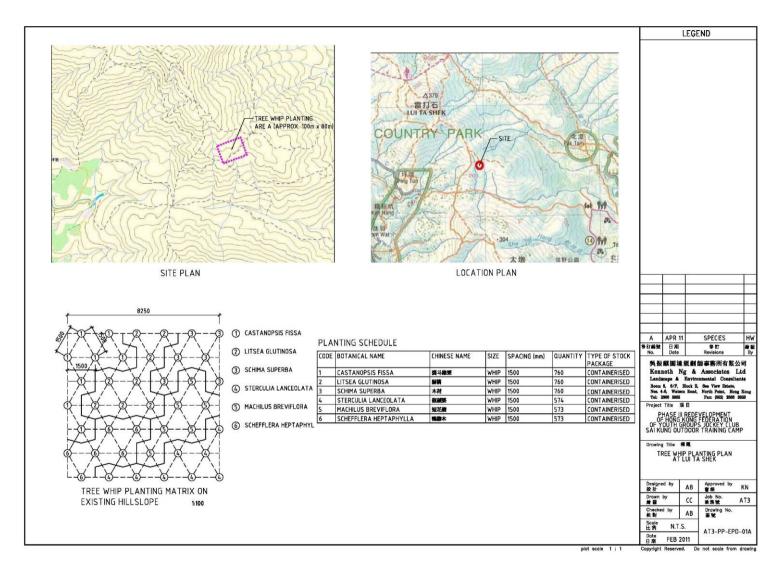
Tree Whip Planting Plan for Off-Site Woodland Compensatory Planting at Lui Ta Shek
